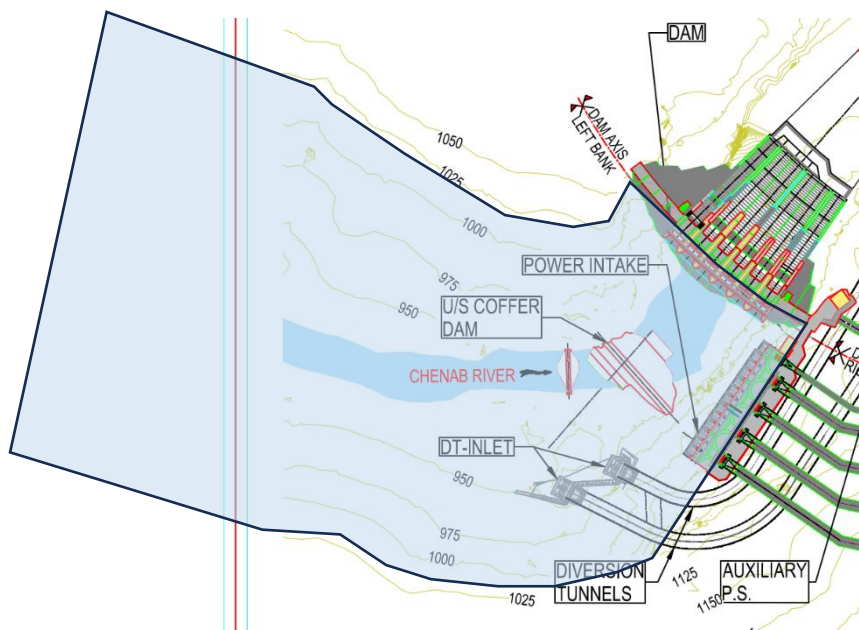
Telemac 3D Reservoir Model Domain – Typical sketch
